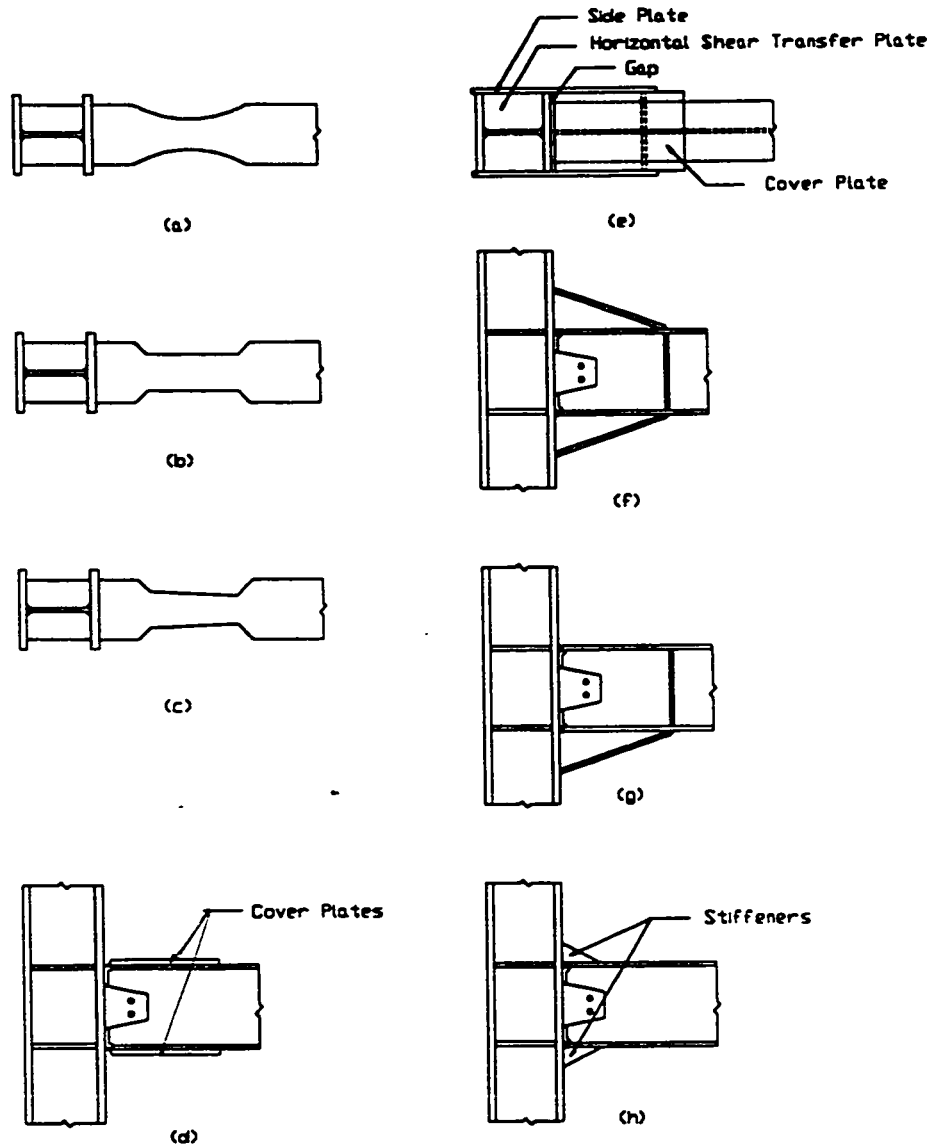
Possible alternatives to the traditional BWBF connection: (a) radius cut reduced flange, (b) constant cut reduced flange, (c) tapered cut reduced flange, (d) cover plates, (e) proprietary side plates, (f) top and bottom haunches, (g) bottom haunch, (h) stiffeners
